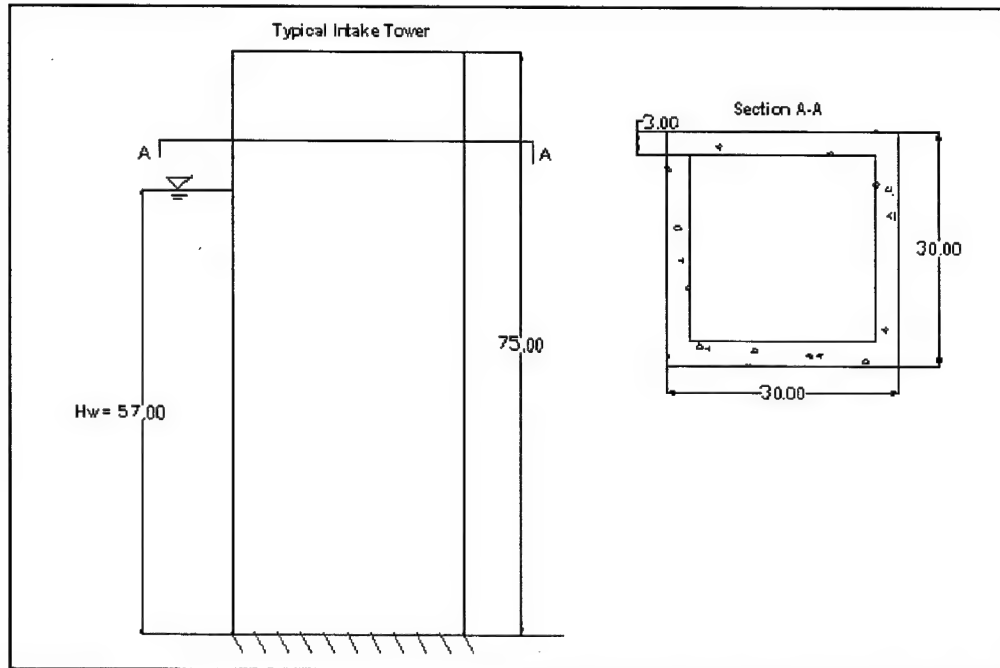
Cross section and front view of the typical intake-outlet tower (units in feet)
